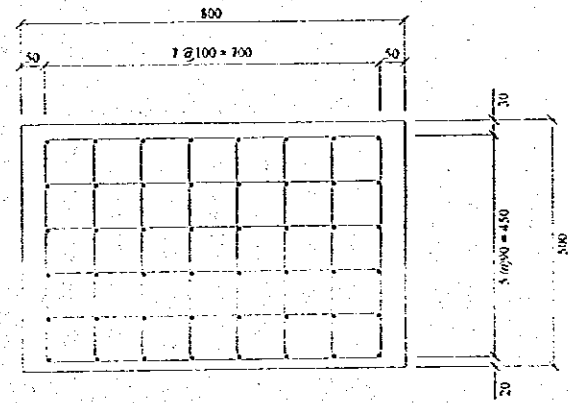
Reinforcing Bar Arrangement of Test Block
